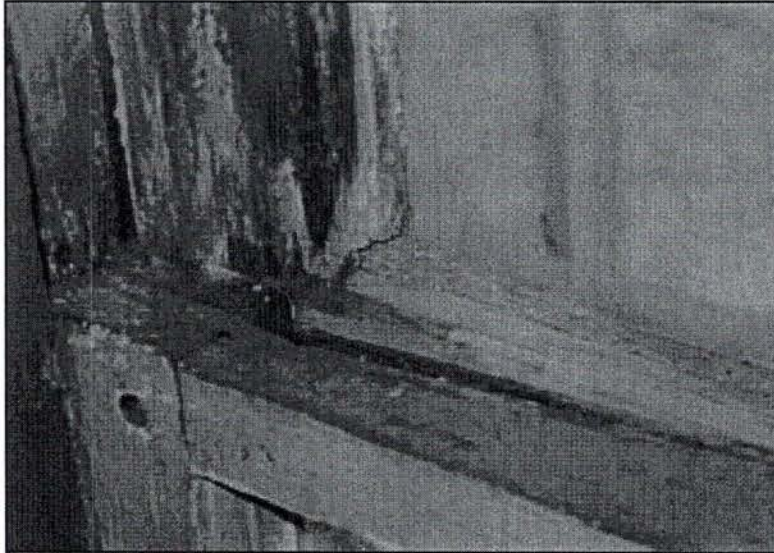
Detail of the wood window in Room 207 showing deteriorating wood and water damage.
